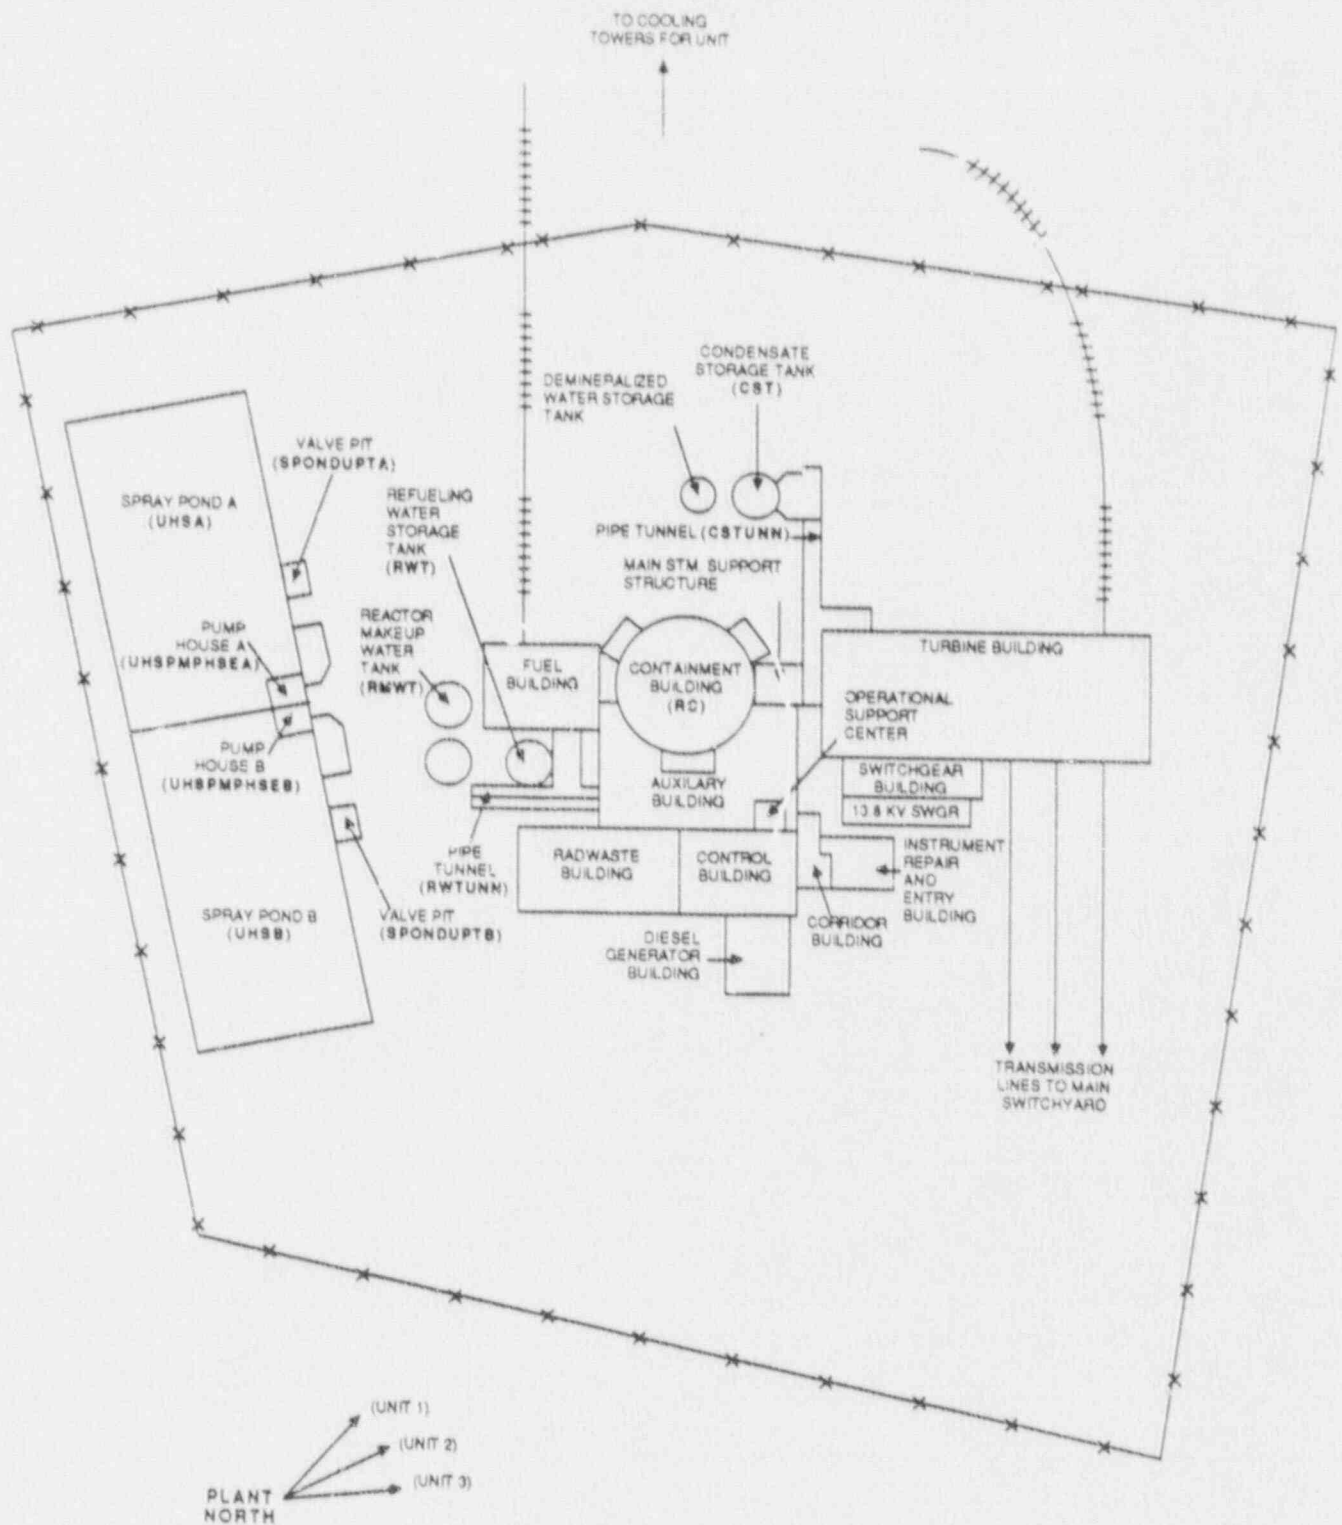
Simplified Arrangement Drawing for a Single Unit at the Palo Verde Site (Typical for Units 1, 2, and 3)
